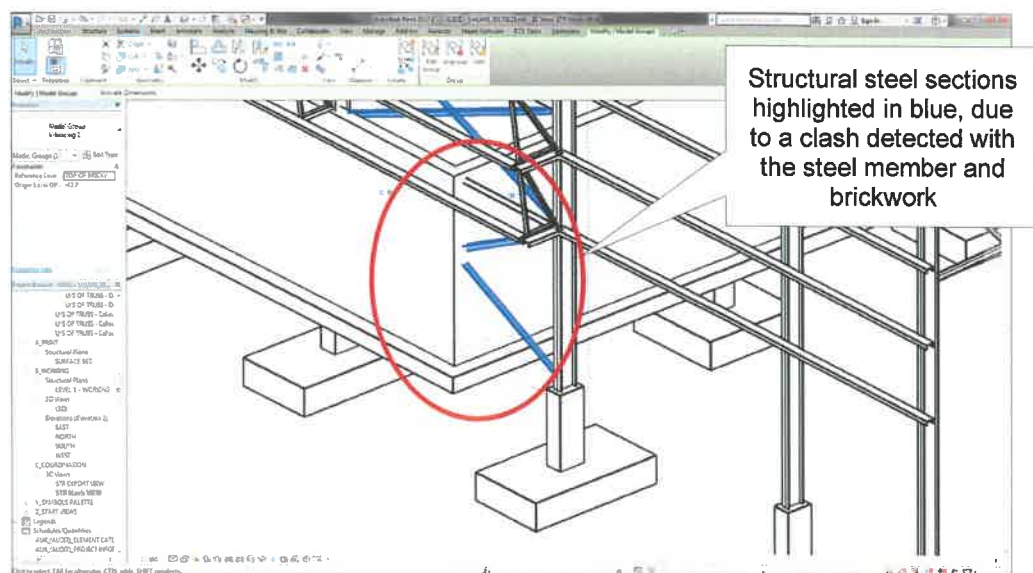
3D BIM Image of a Design Clash on the Manufacturing Building
